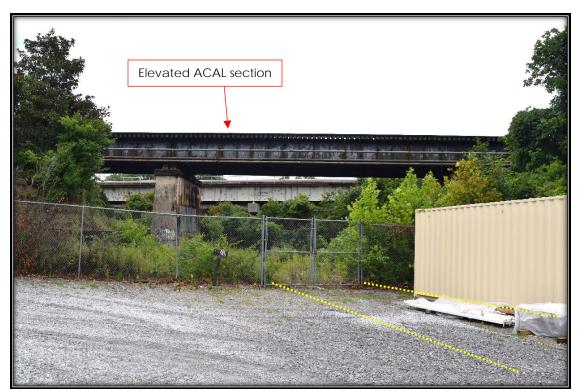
View facing east towards a chain link gate leading to the existing gravel drive below the elevated section of the resource, with the approximate alignment of the proposed shared-use trail highlighted.
